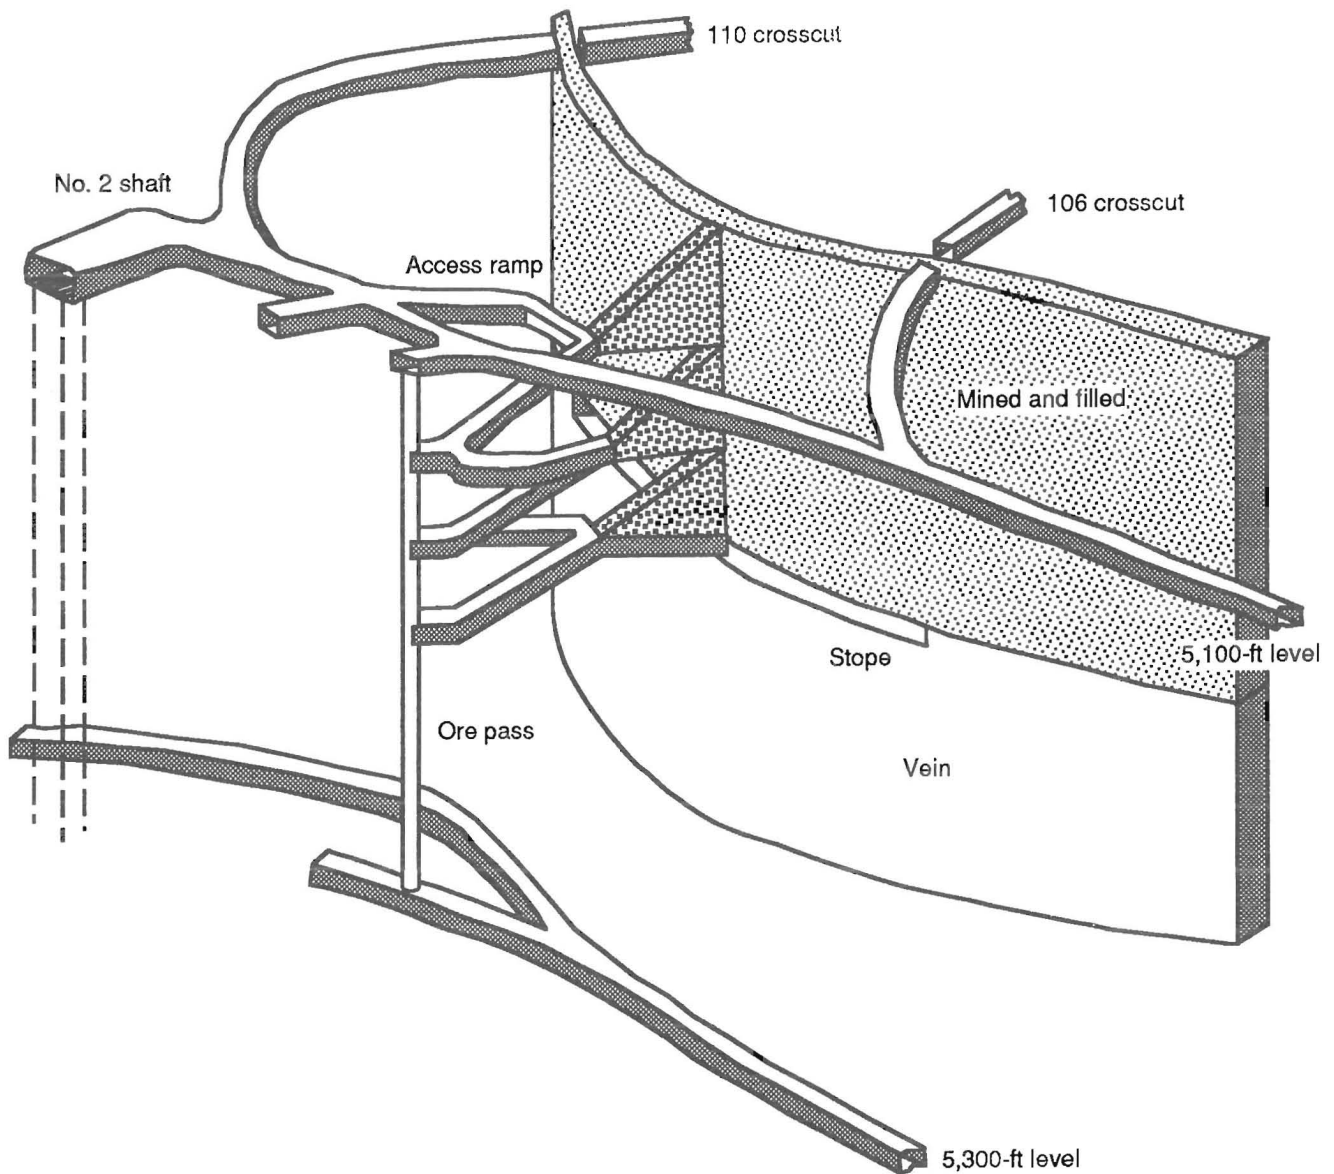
Underhand longwall mining method as implemented in LFUL stope.
